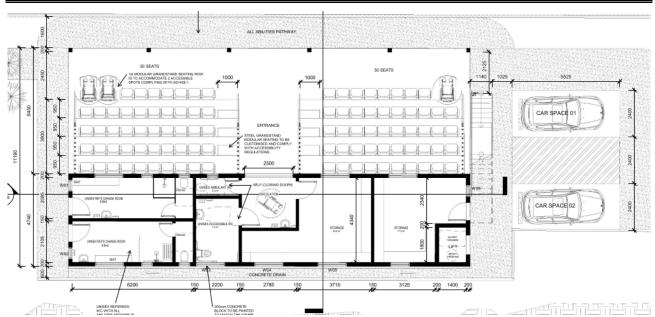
Ground Floor Plan – 2 unisex referee toilets, 2 unisex toilets and 2 storage areas.
